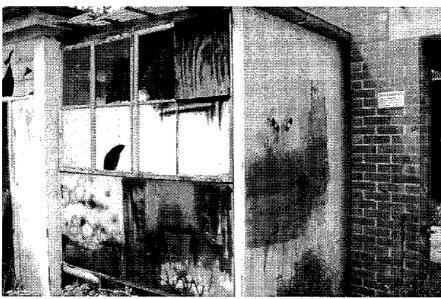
Asbestos cement sheeting located on the external wall cladding at the rear of residential tenancy at 89A Liverpool Road.
